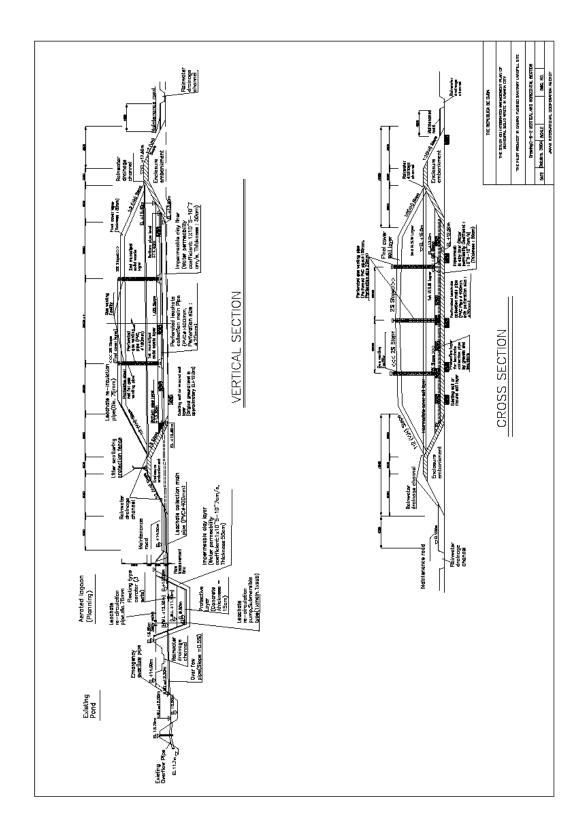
Section of Pilot Project in Campo Florido Landfill Site
